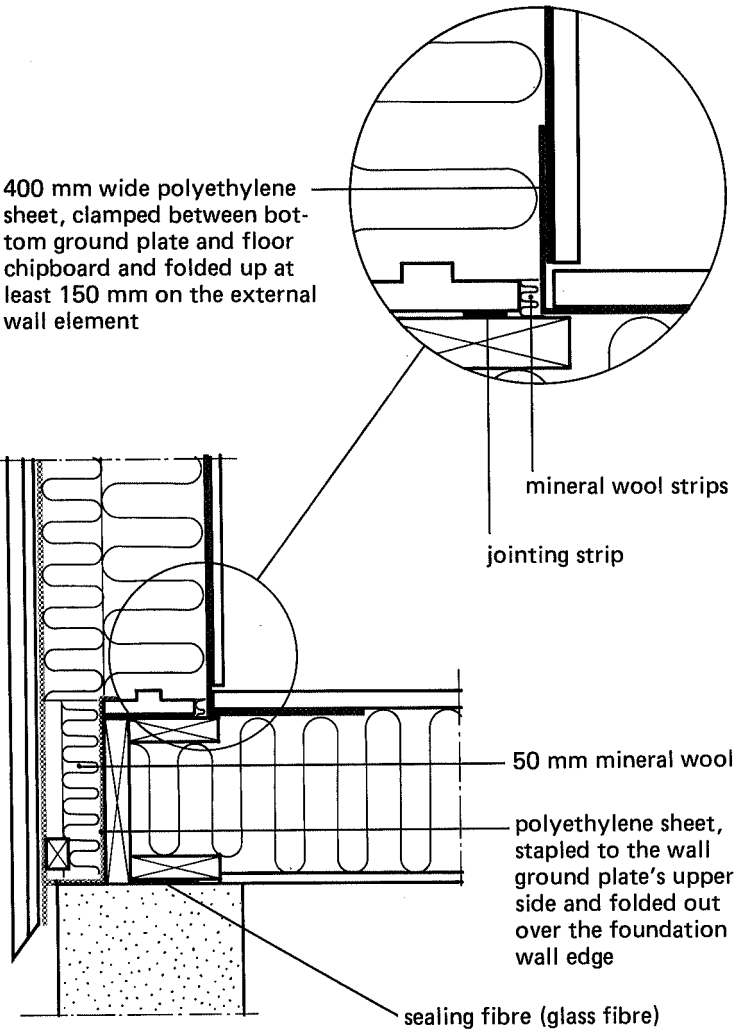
Joining outer wall element – joist structure above crawl space. »Sealing fibre« for ground plate insulation is a glass fibre strip covered with thin polyethylene foil. The ground plate must not be blocked up if good sealing is to be achieved.
